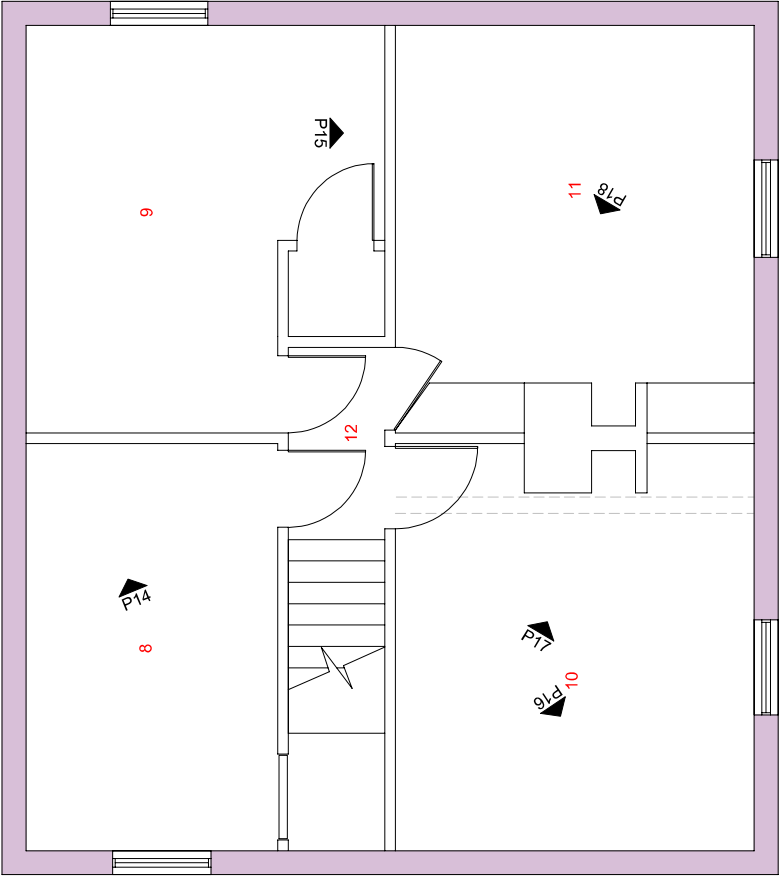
First floor plan. Location and direction of photographs reproduced in text shown.
